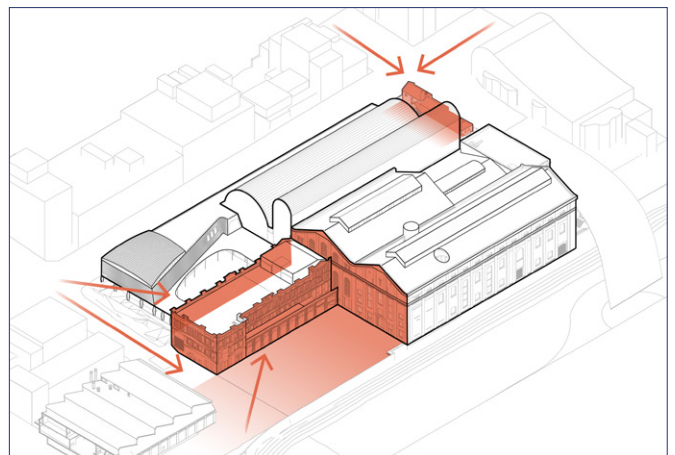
The new building is shaped to create new and improved visual connections to the heritage fabric (source: Durbach Block Jagers & Architectus)
